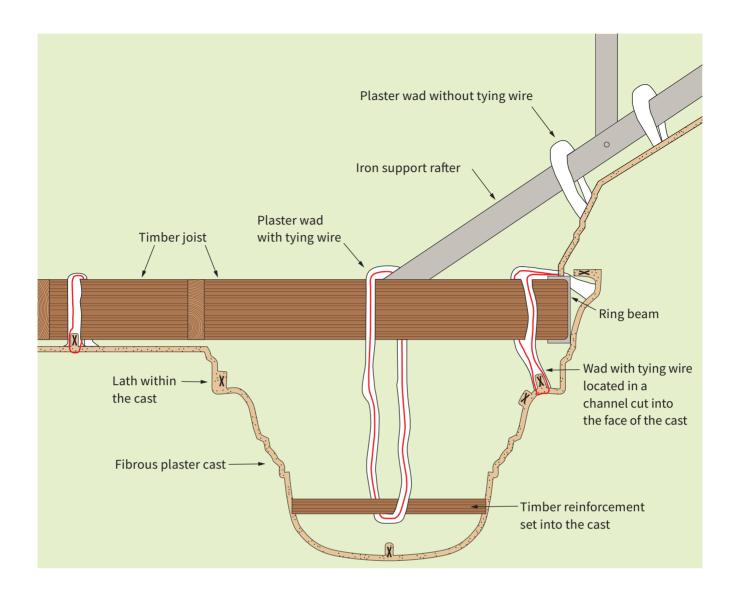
Section though a fibrous plaster ceiling showing wads connecting it to structural elements above. The nature of such construction can vary widely. In this example, some wads have wires tied to the underside of the cast. Other wads, without wire, are simply fixed to the cast by means of plaster within the wad.
